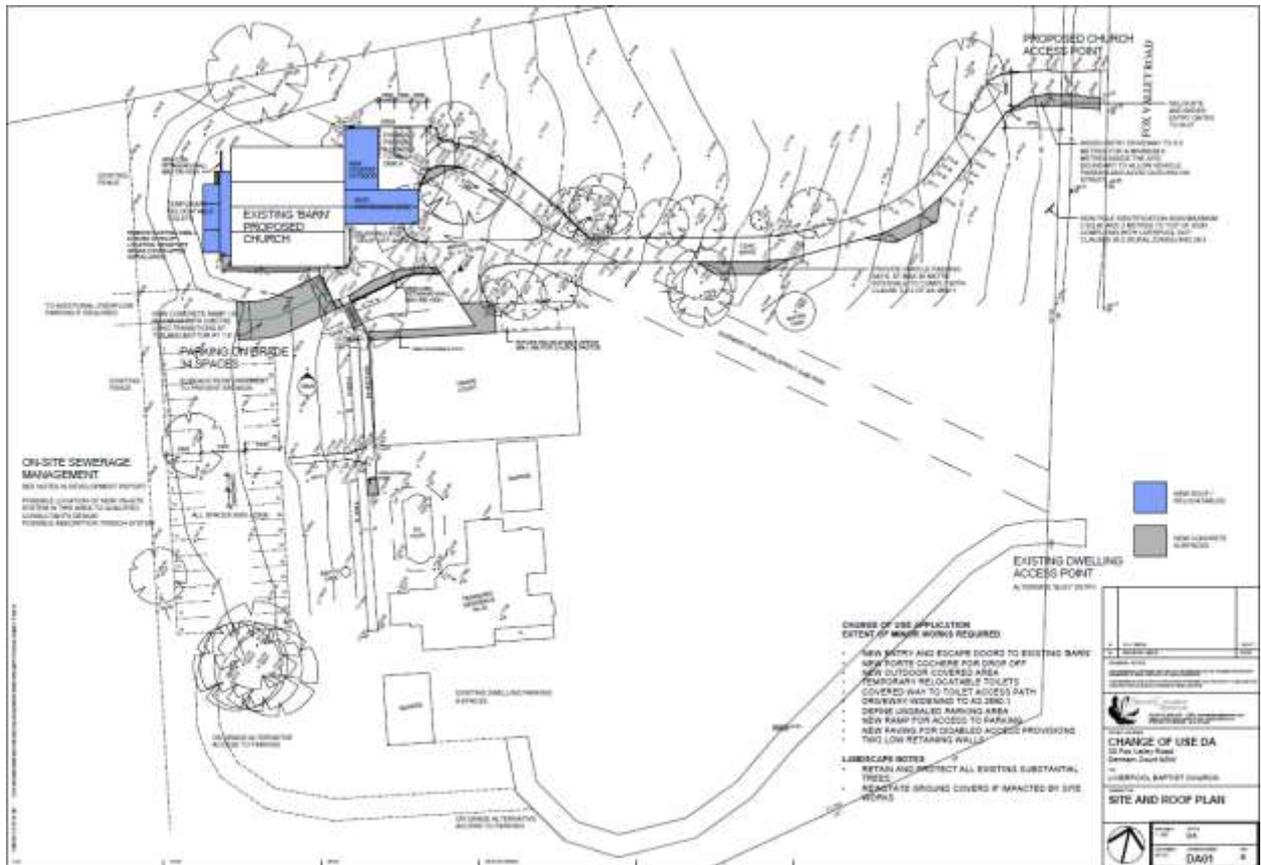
Site plan of 30 Fox Valley Road, Denham Court.
